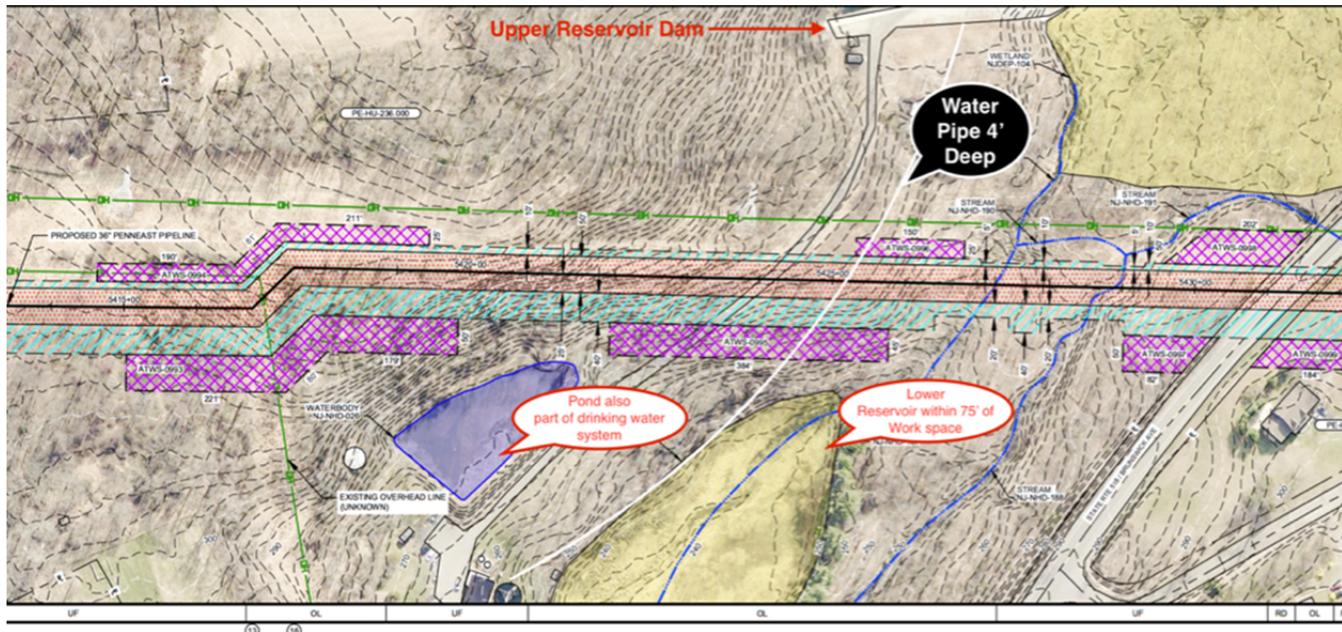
Annotated PennEast plan at Suez site. PennEast construction plans would sever the transfer pipe to the treatment facility
